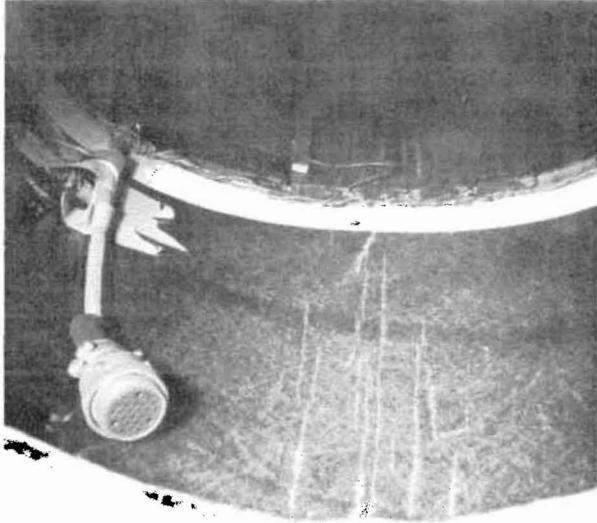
Cracking pattern in bottom of 18-inch (46-cm) diameter FRP pipe (Test E). Photo P801-D-73867
